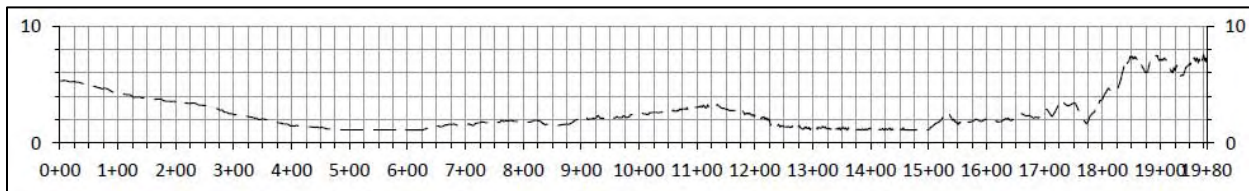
Elevation profile, from north to south, of Narrow River Road extending from Route 25 to downstream of the earthen berm with the double culverts. Elevation is in feet on the y-axis and the stationing along the x-axis corresponds to the station numbers indicated on the map above.
